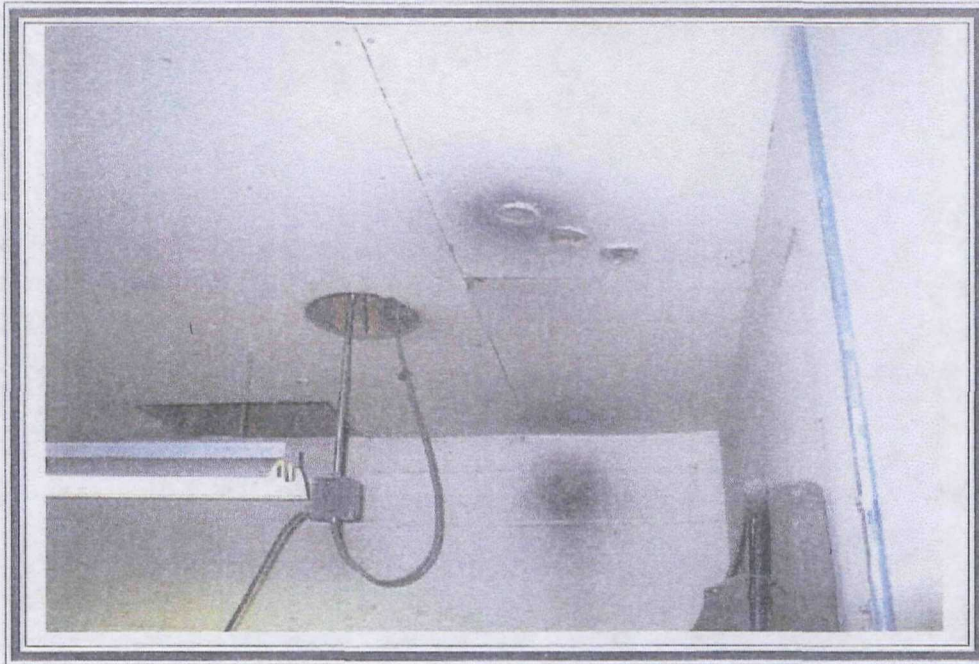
Damaged fiber board observed on the ceiling of the drill press room.
